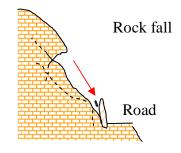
Rock Slope Collapse (RC) along Wright-Taft Road (km 846+050)
